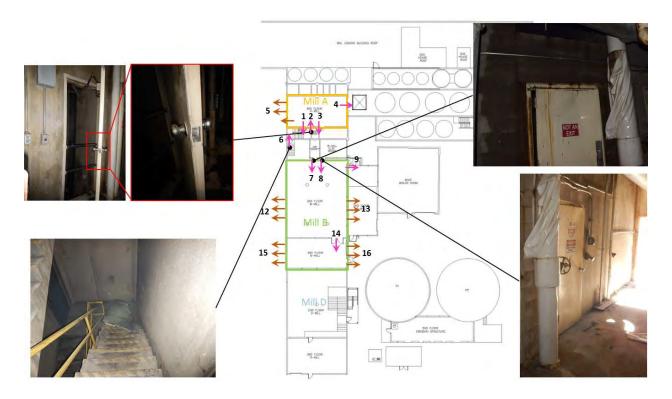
Mill A and Mill B Level 3 Exemplar Directional Indicators
